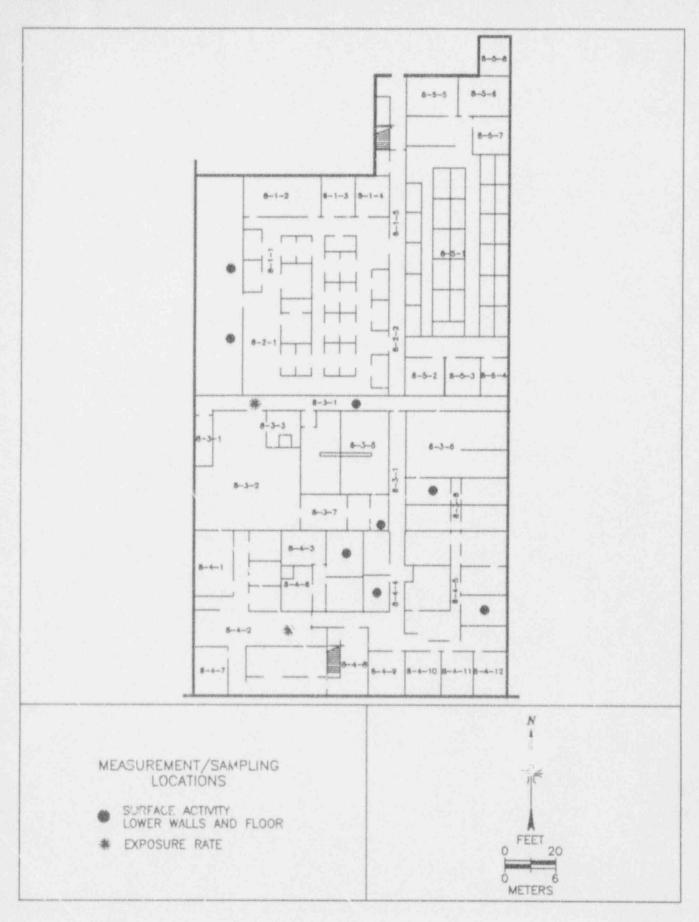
Building 8A, First Floor - Measurement and Sampling Locations
